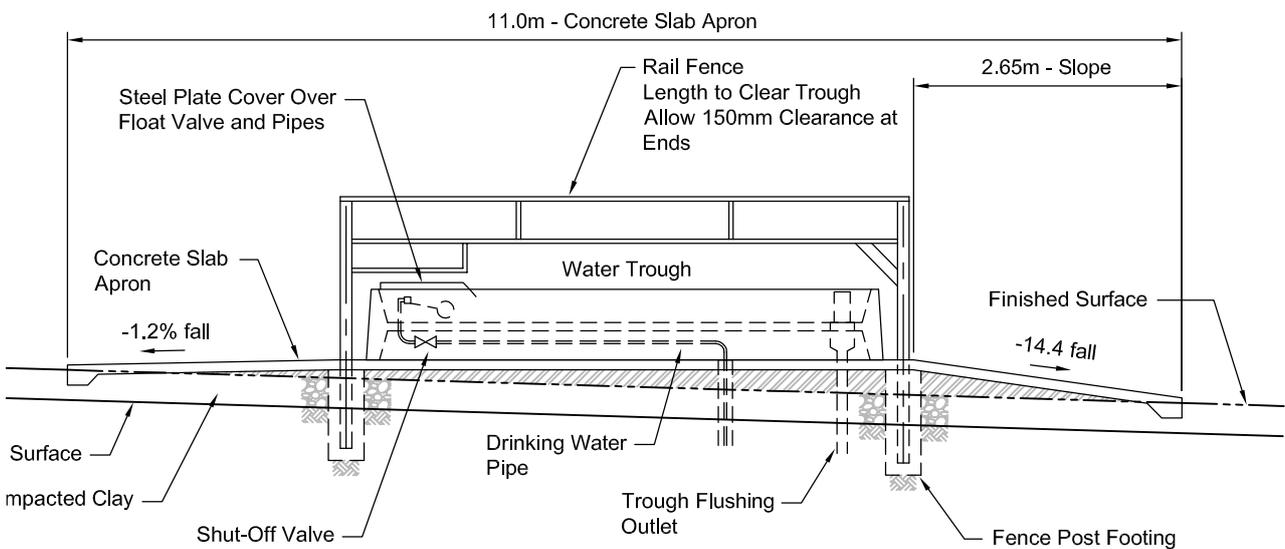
Typical concrete apron long-section details with apron graded down at 1% on upslope side
